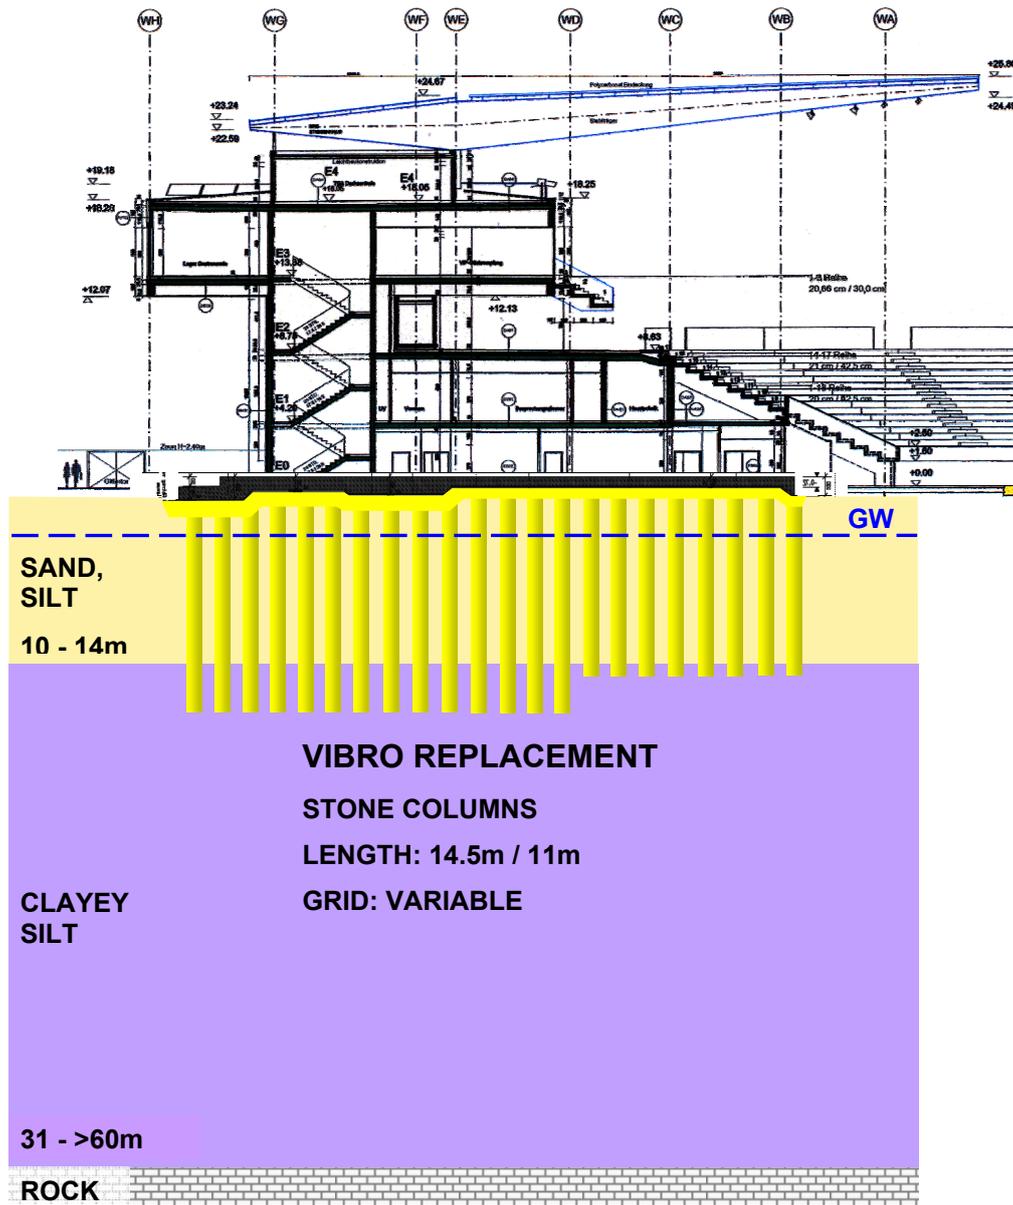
Cross section of the west building, raft foundation and stone columns.
